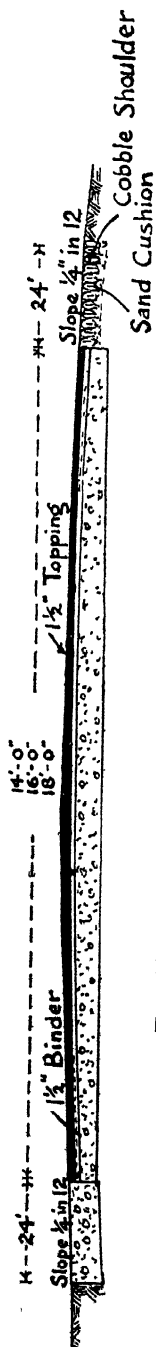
OLD CONCRETE ROAD WIDENED AND RE-SURFACED.
